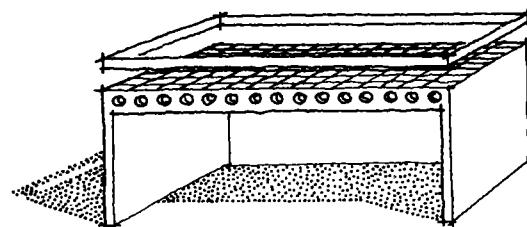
Ventilated pavement on a roof terrace (see also details VII.5).
